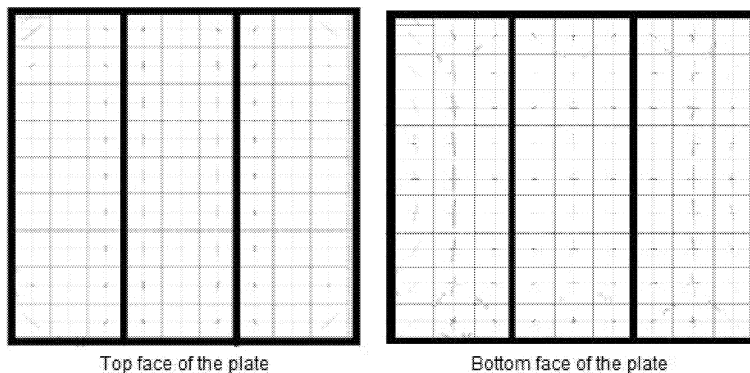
Typical crack pattern for a stiffened-plate with internal non-yielding beams
